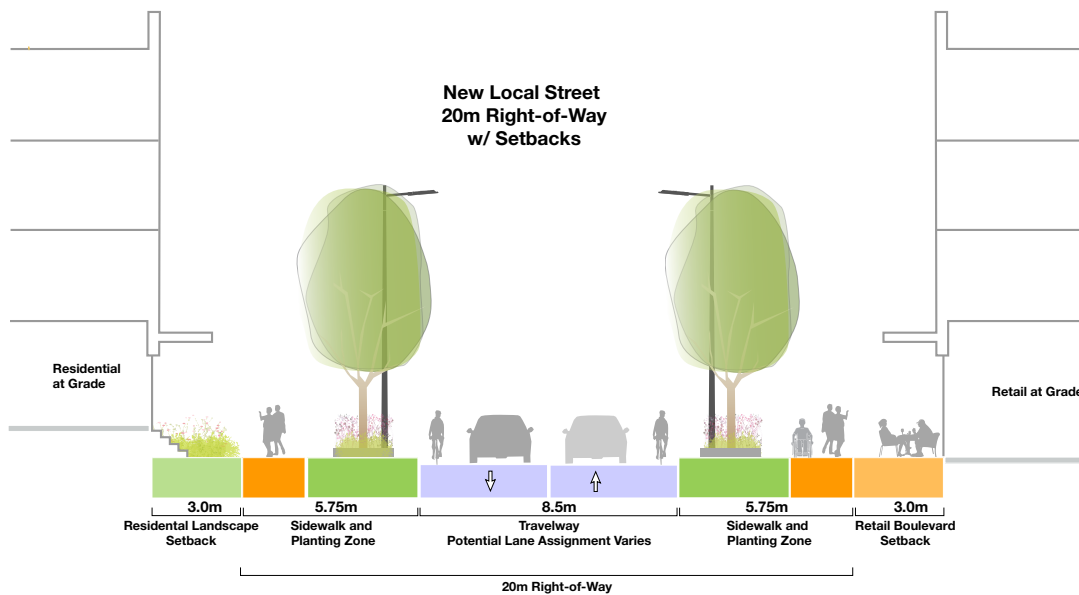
New Local Street Streetscape - Typical Section (Option 2)
